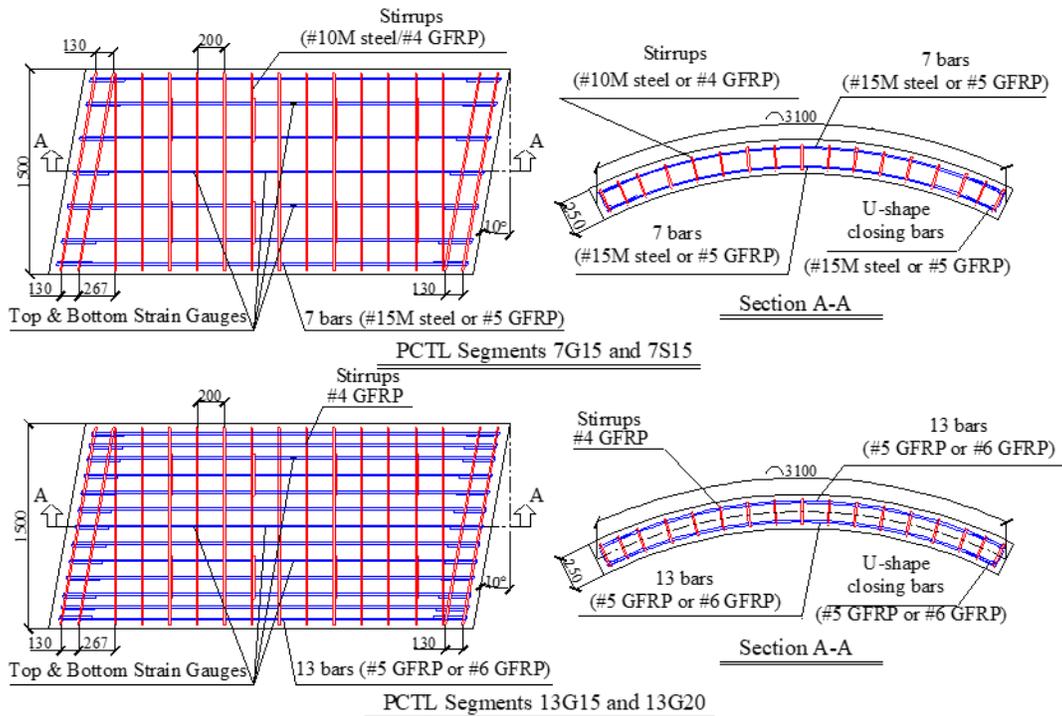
Reinforcement details for the test specimens. (Note: all dimensions in mm; 1 mm = 0.0394 in)
